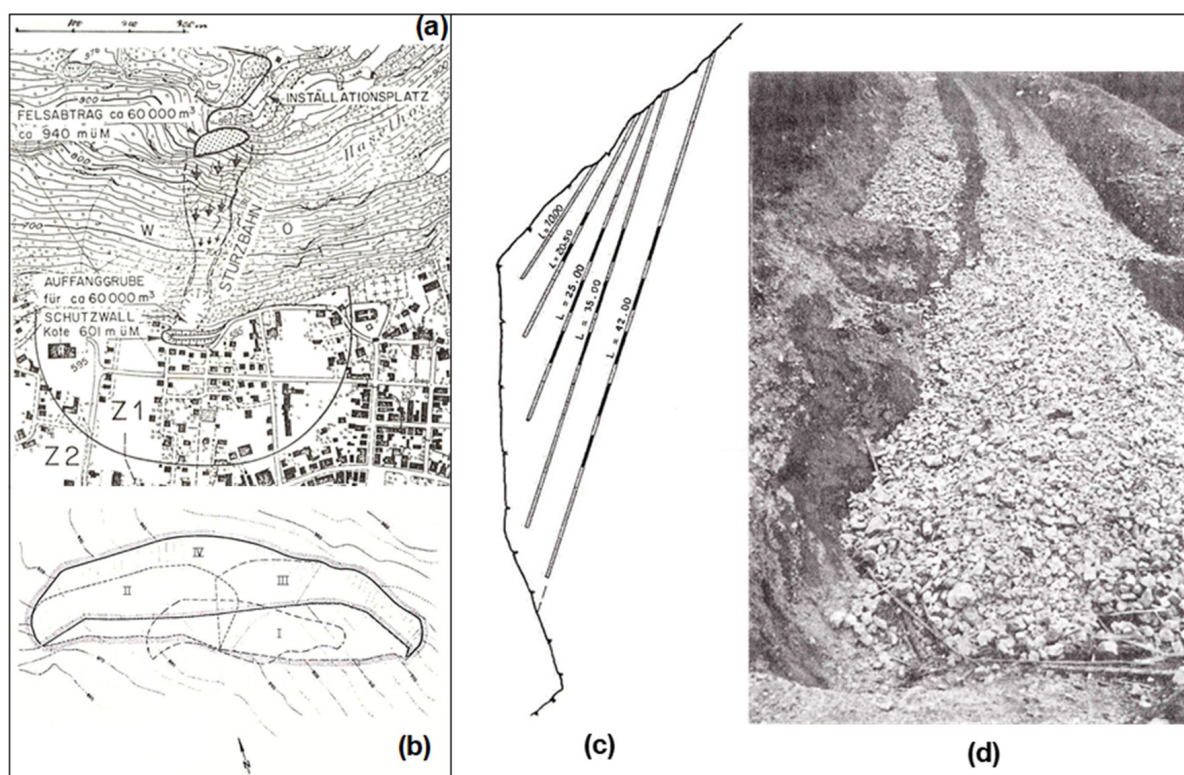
The case of Meiringen in Switzerland. (a) Plan view of the blasting project. Z1 area to be evacuated; (b) detailed plan with the subdivision of the block to be blasted in 4 rounds; (c) lateral section of the drill hole pattern from the firing plan of the second round; (d) view of the muck fan after the first round (modified after [18]).
